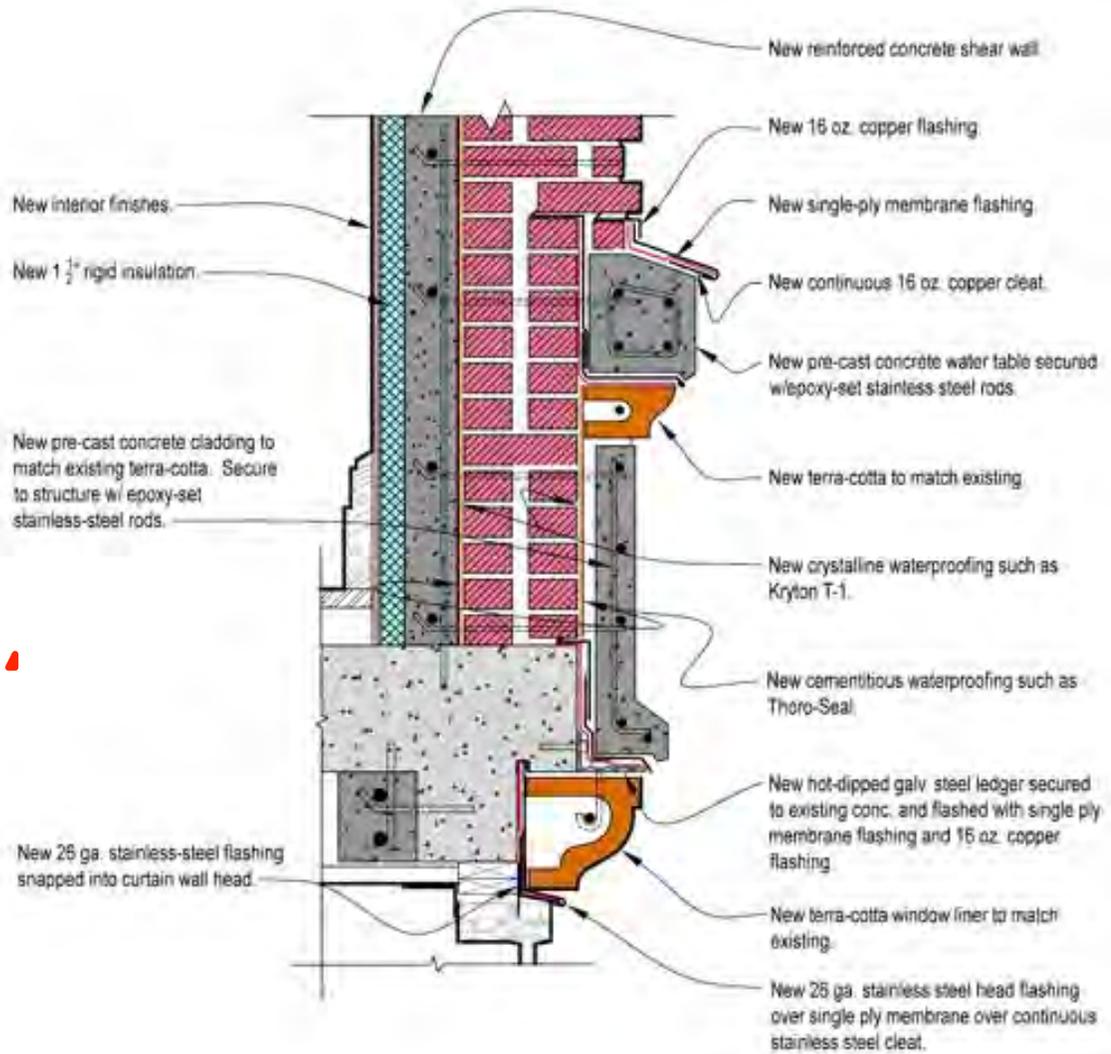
(1): Terra-Cotta window Bay Surround Replacement at Level 4 Heads
